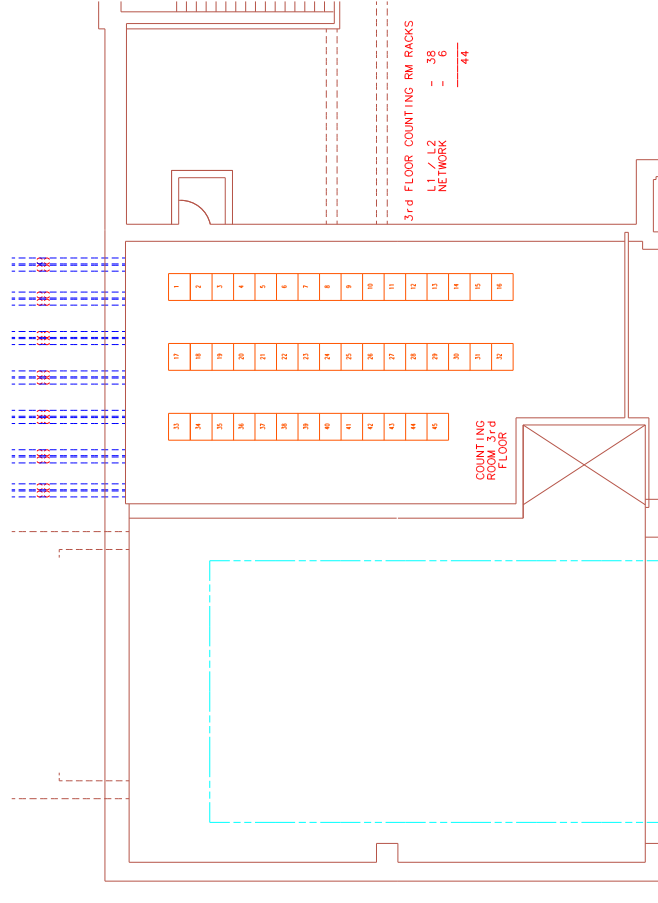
Layout of C0 Counting Rooms: Third floor.
